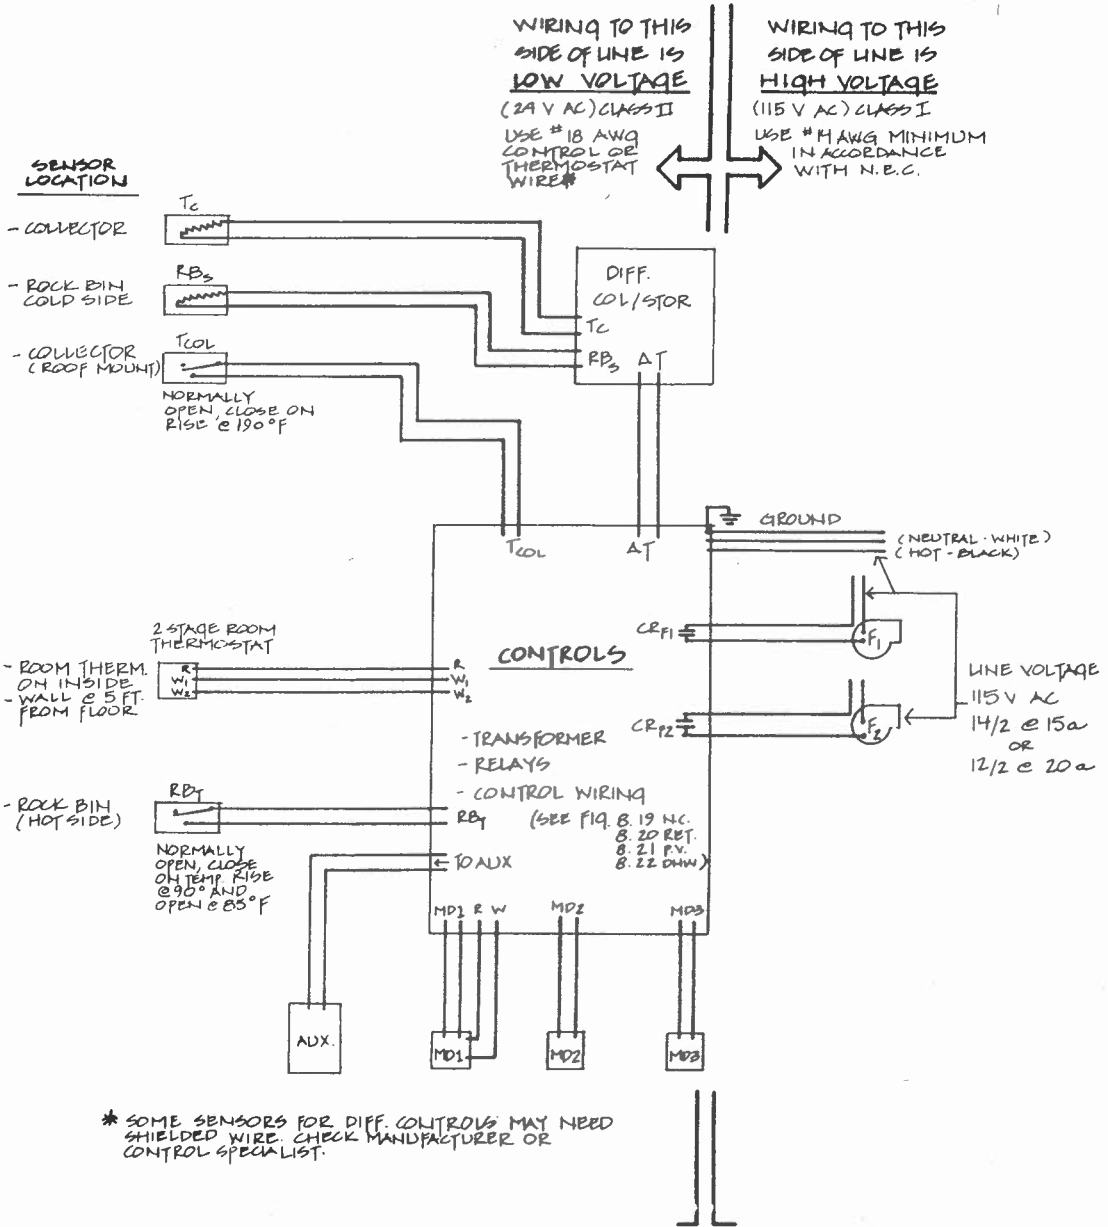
Field Wiring for Roof Collector With Storage and Power Venting
